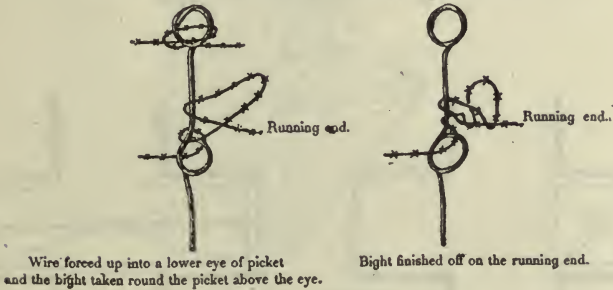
METHOD OF FASTENING BARBED WIRE ON PICKET.
